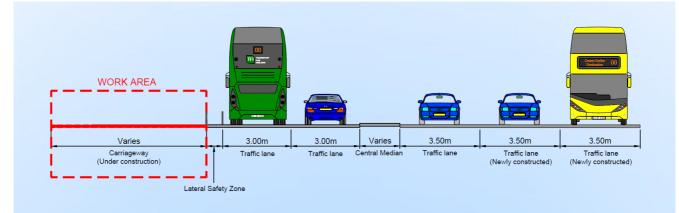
Traffic Management Cross Section, Section 2f - Stage 2
